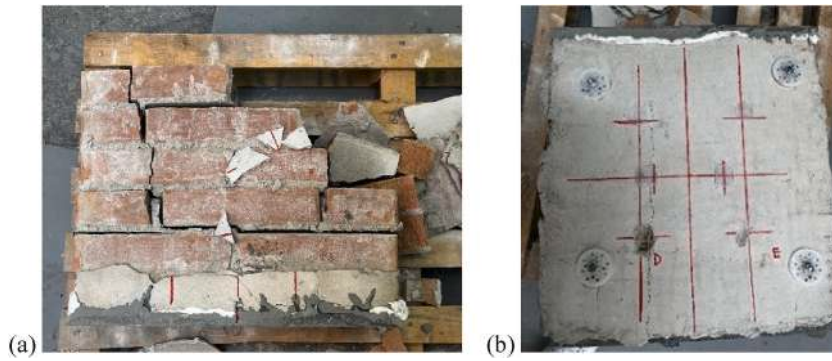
Crack patterns of the unreinforced (a) and reinforced (b) walls after compressive test.
